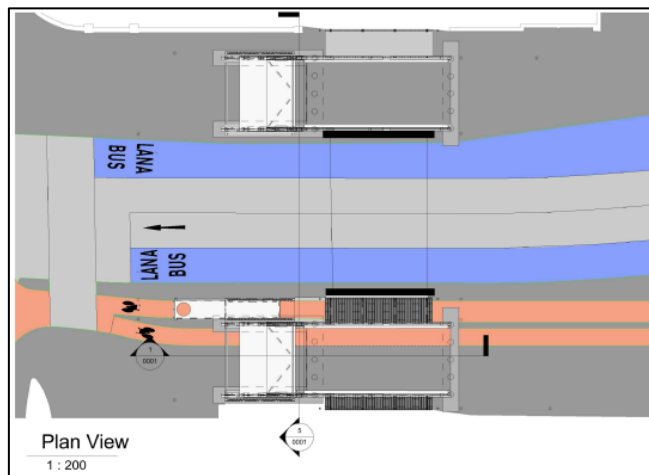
Proposed relocation of *Scherzer Bridges* and new bridge at Area D (*Spencer Dock*).
